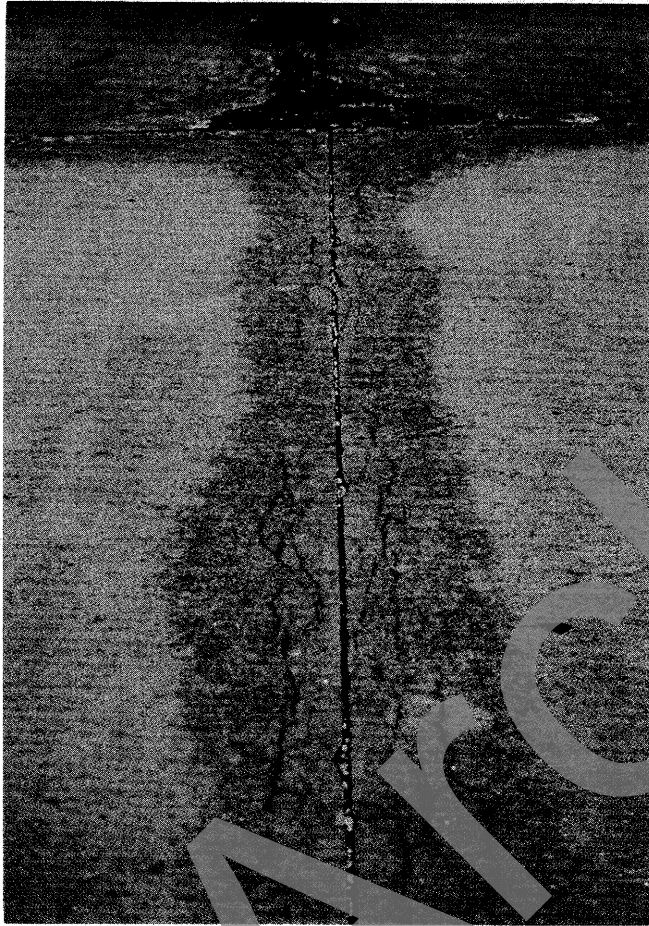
More generalized map cracking due to ASR in a jointed pavement.
